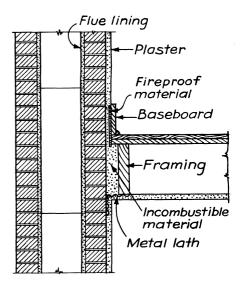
Method of insulating wood floor joists and baseboard at a chimney.
